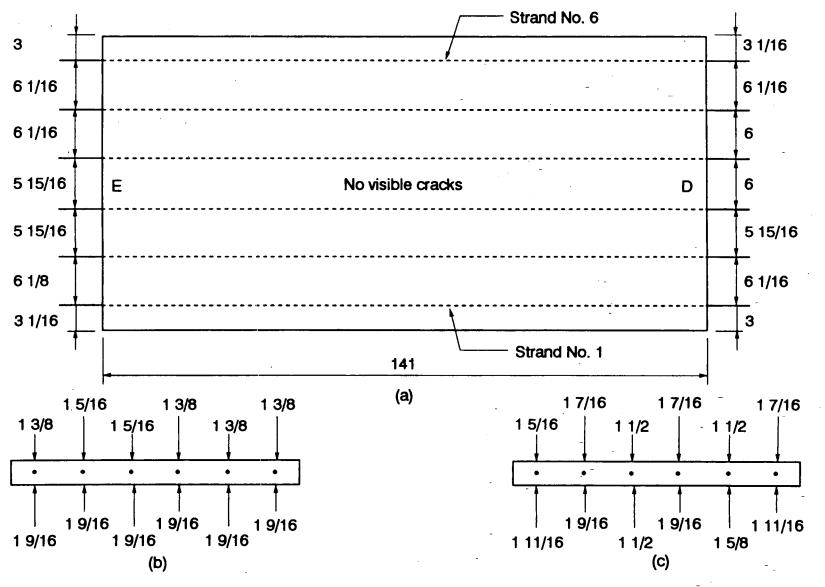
Specimen No. 13-3.0TC-3 (dimensions shown in inches):
